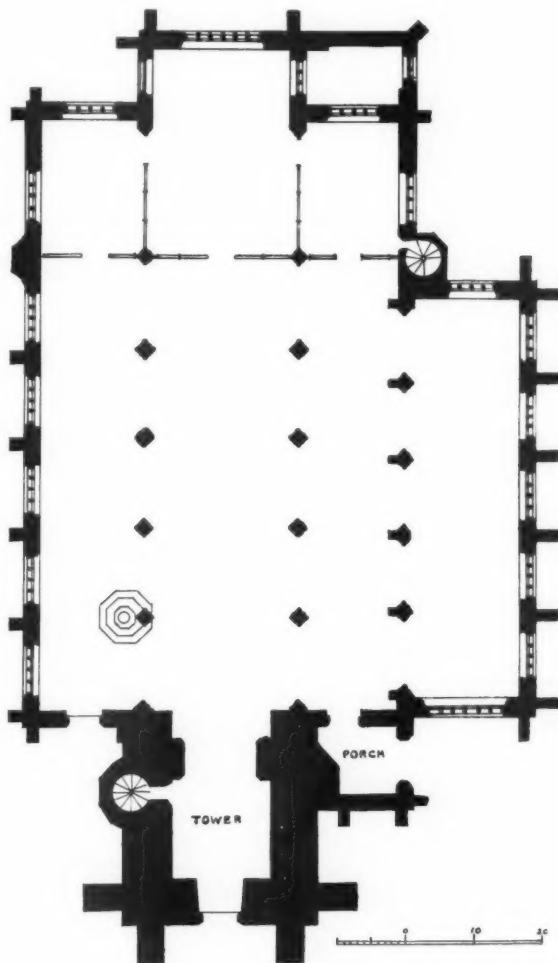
CULLOMPTON CHURCH: PLAN.
